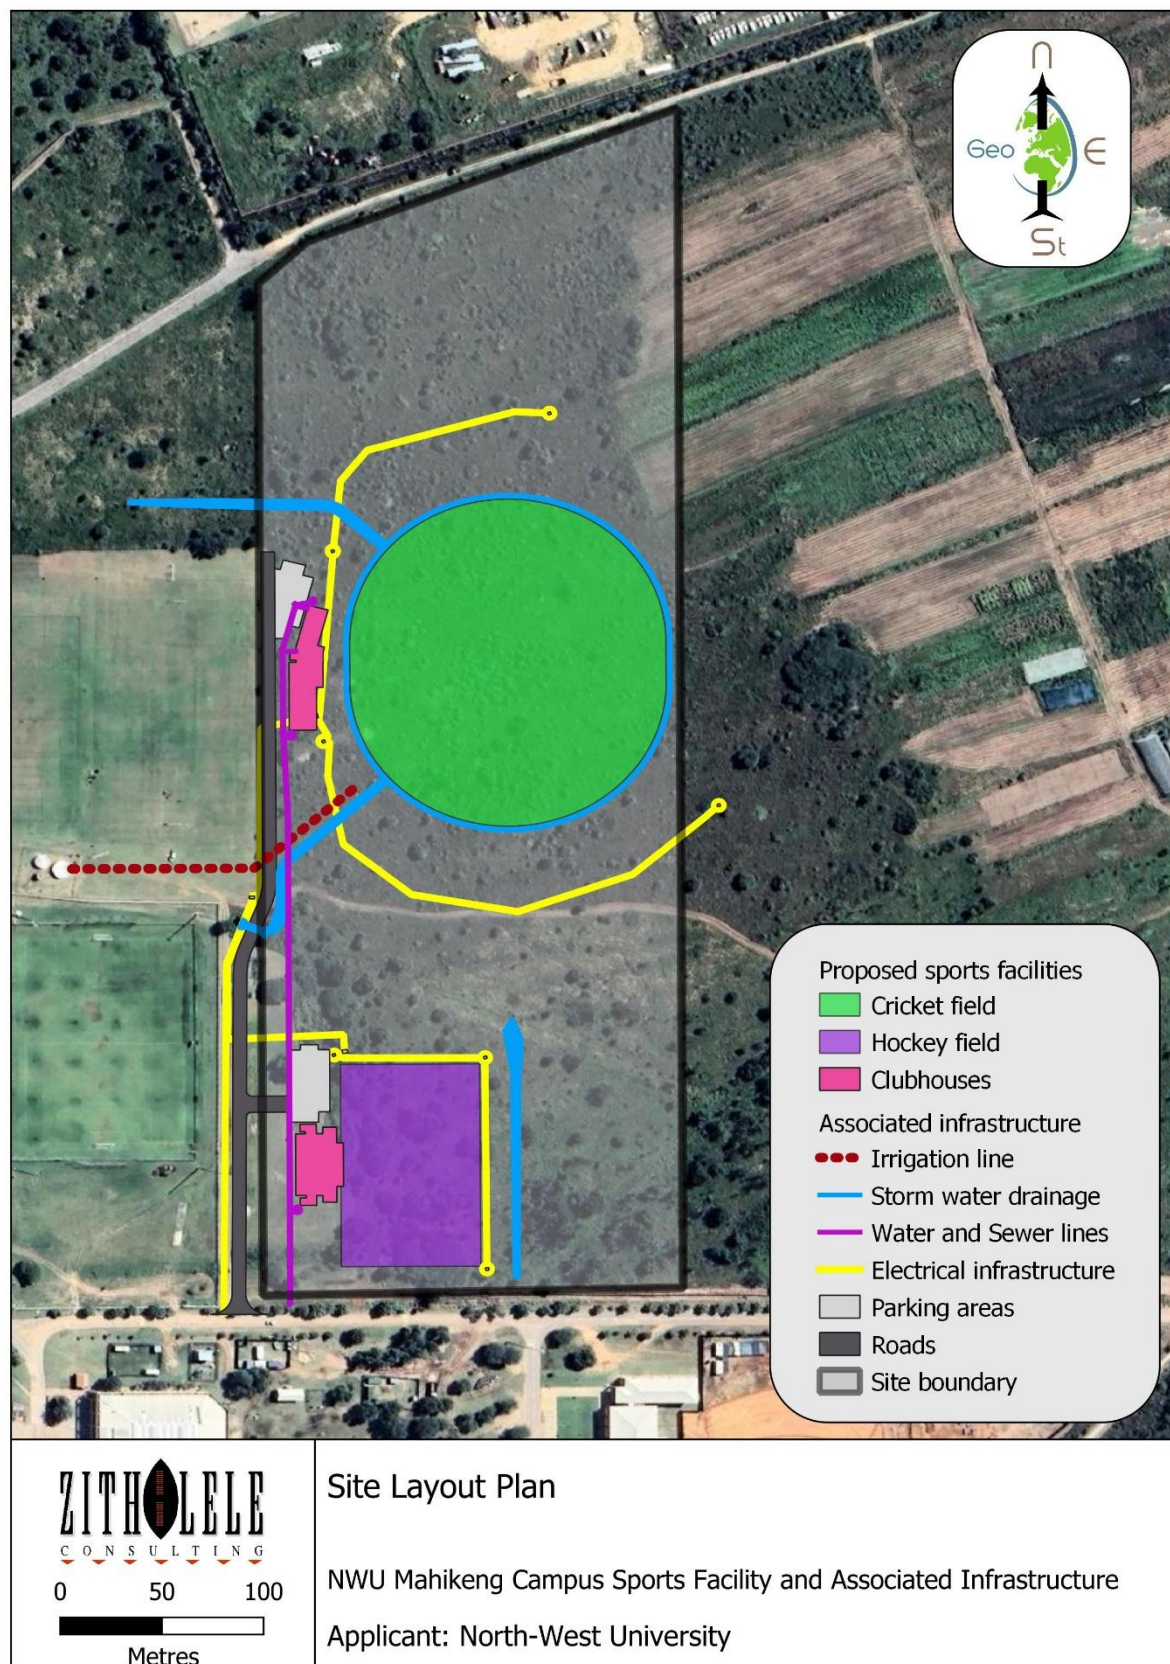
Proposed Site Layout Plan for the sports facility and associated infrastructure
